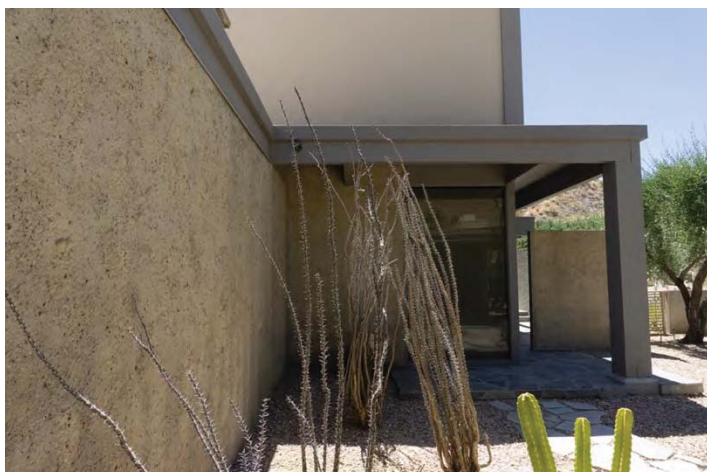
West elevation. Looking towards guest house from front entry, tilt-up panel example at left.
